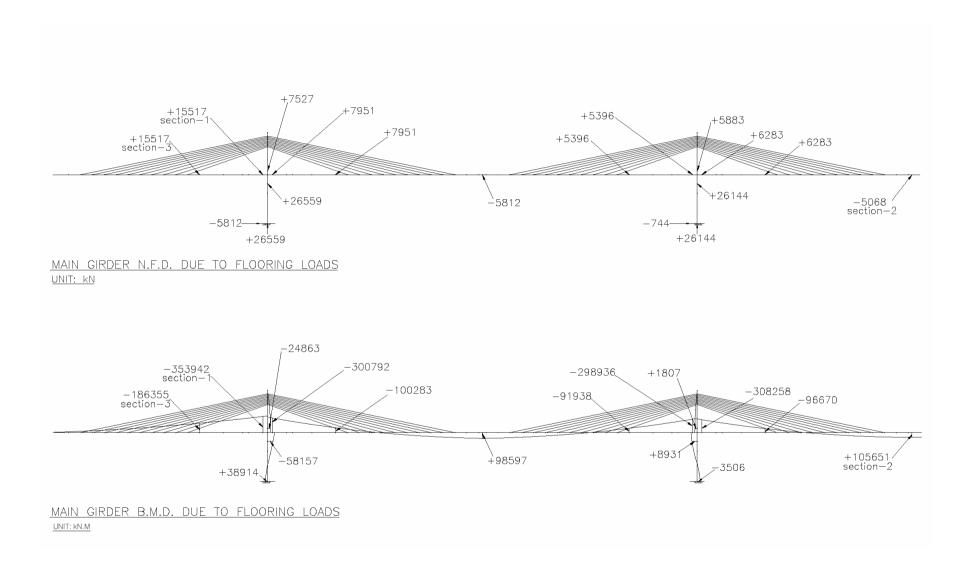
Bending Moment and Normal Force Due to Flooring Loads
